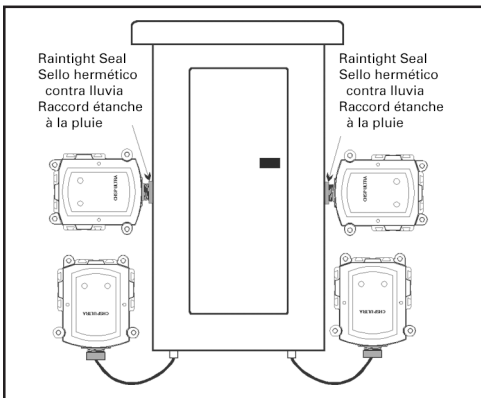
Outdoor Installation (2)/Instalación exterior (2)/Installation à l'extérieur (2)
